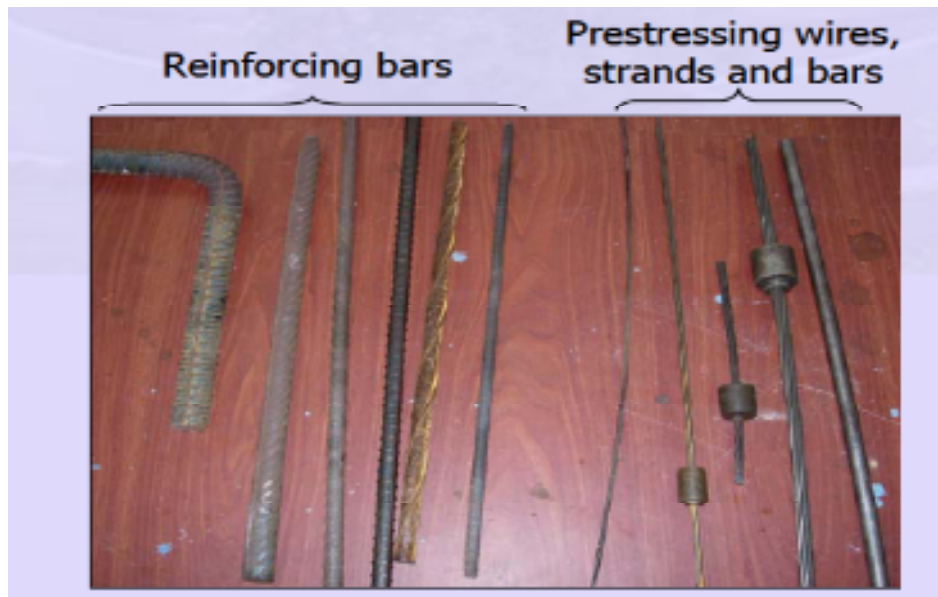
Forms of reinforcing and pre-stressing steel [Amlan et al. (section 1.7)]
